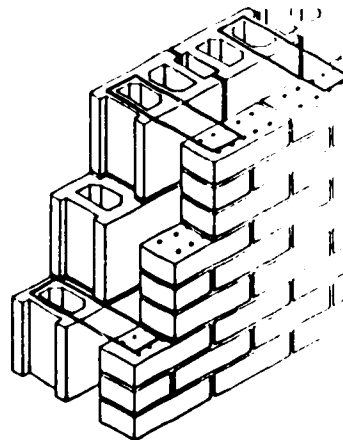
Adjustable Ladder/Truss Pattern With Rectangular Ties
